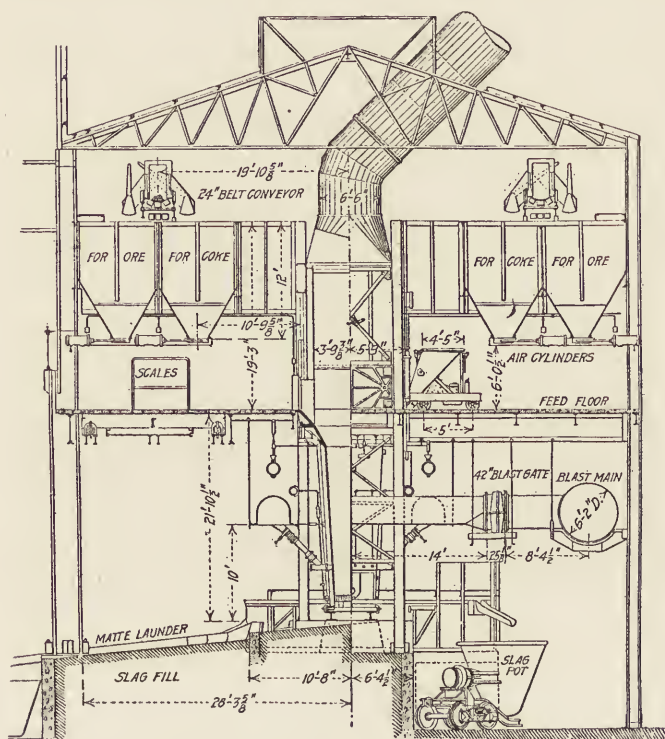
Blast-furnace plant, Calumet and Arizona Mining Co.
